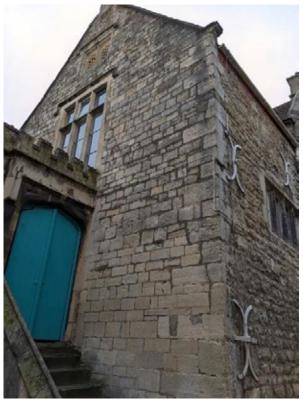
Exit from corridor between first floor meeting room and kitchen, and south wall of meeting room
